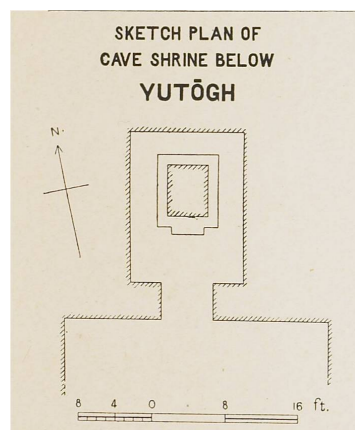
Sketch Plan of Cave Shrine below Yutōgh
